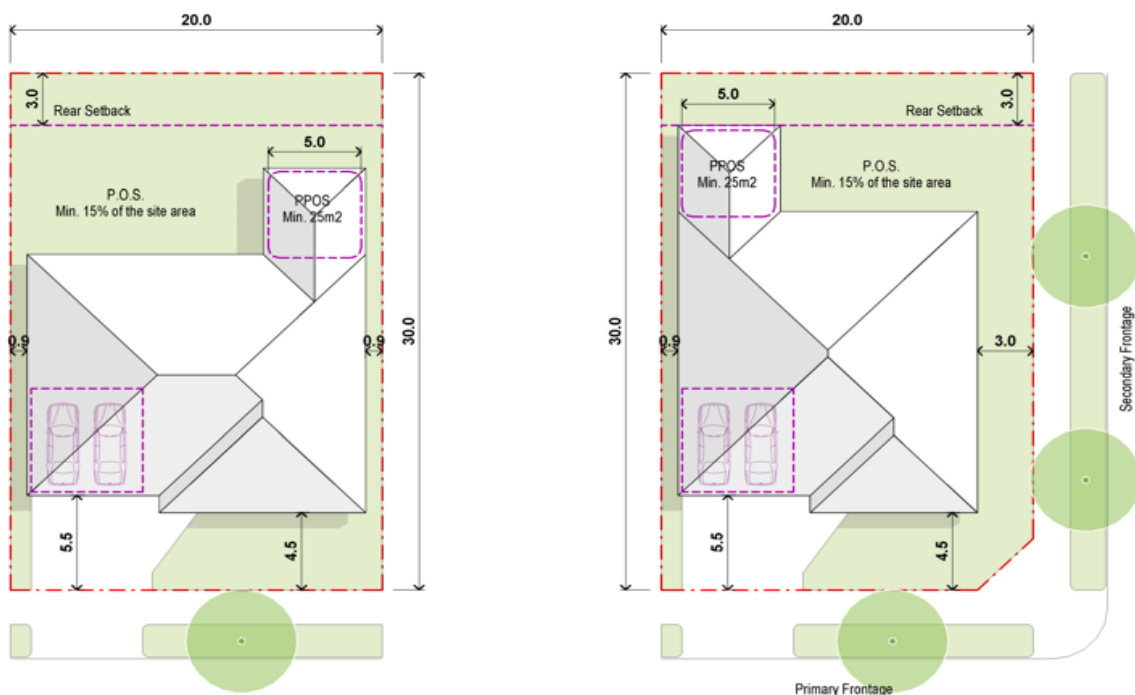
Typical 600m<sup>2</sup> Dwelling House
